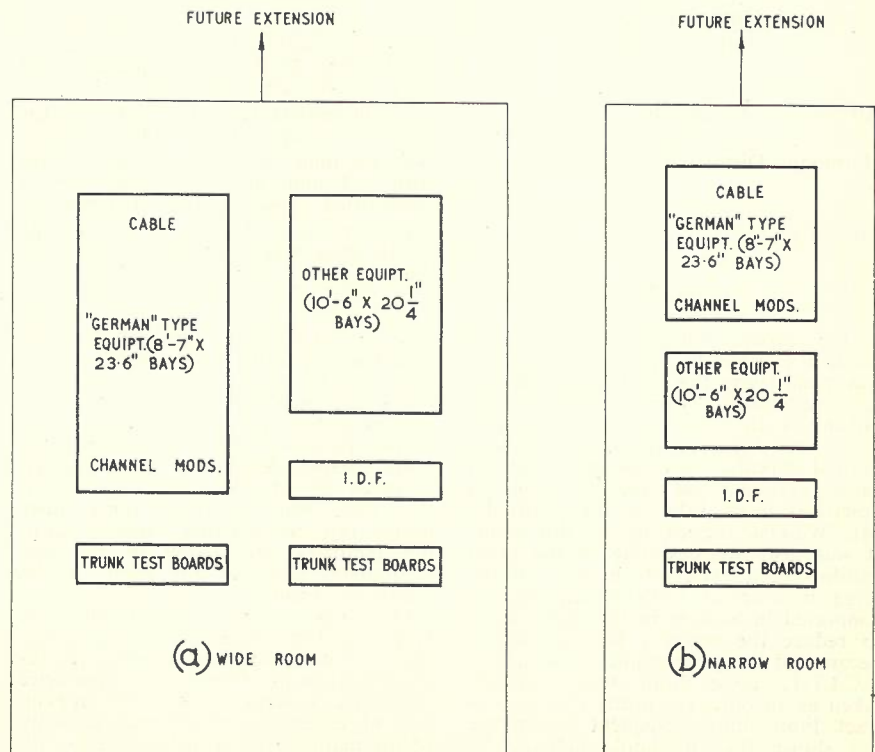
General Layouts of Trunk Equipment Rooms at Terminal and Main Repeater Stations.
